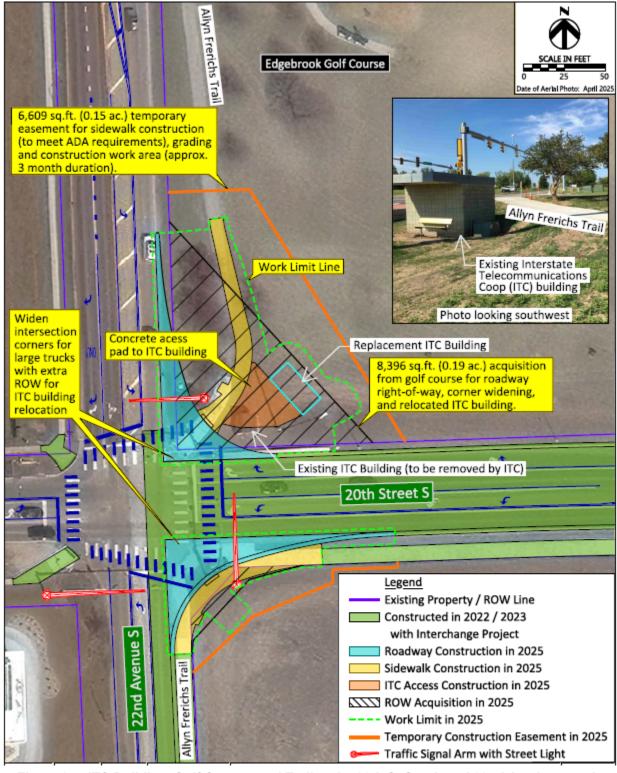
ITC Building, Golf Course, and Trail at the 20th St South and 22nd Ave Intersection
